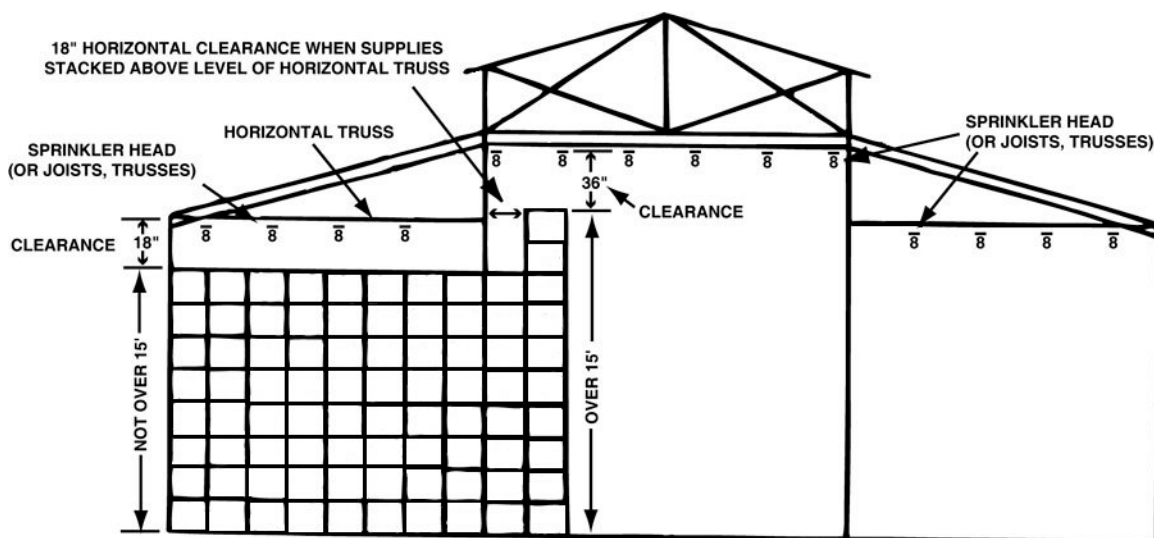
Clearance of material from sprinkler heads and roof trusses.
